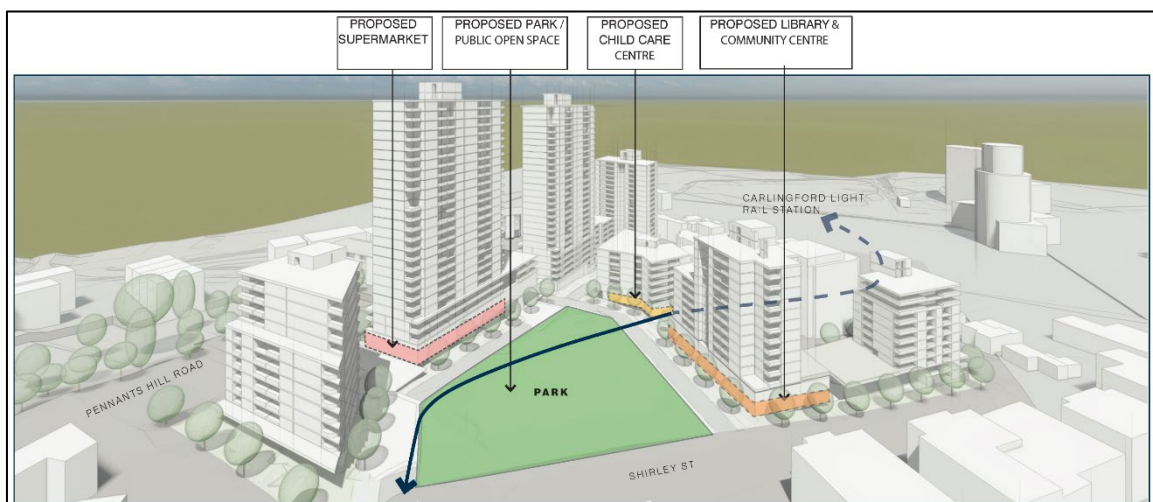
Indicative future-built form on the subject site (Source: applicant)
